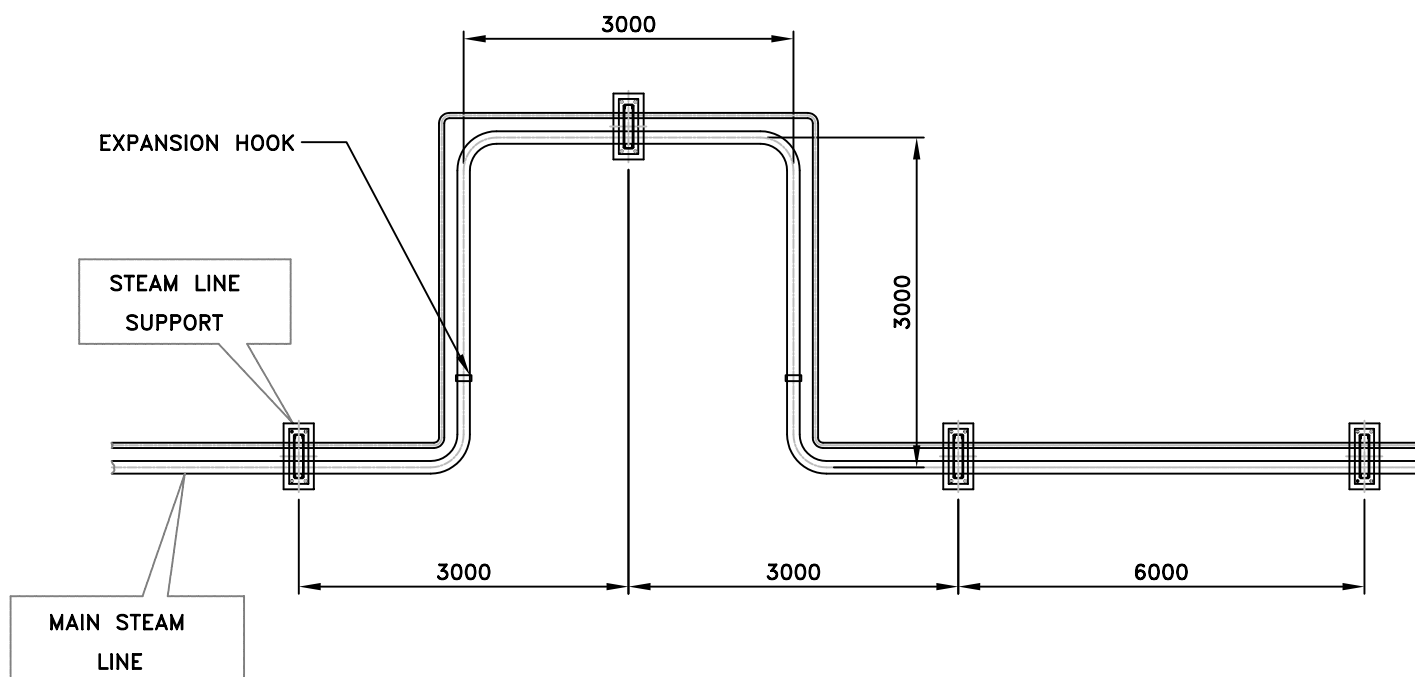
TYPICAL STEAM PIPING LAYOUT
